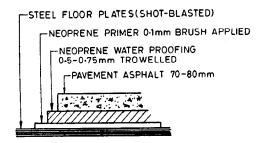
WATERPROOFING OF BRIDGE DECK FOR CORROSION PREVENTION
